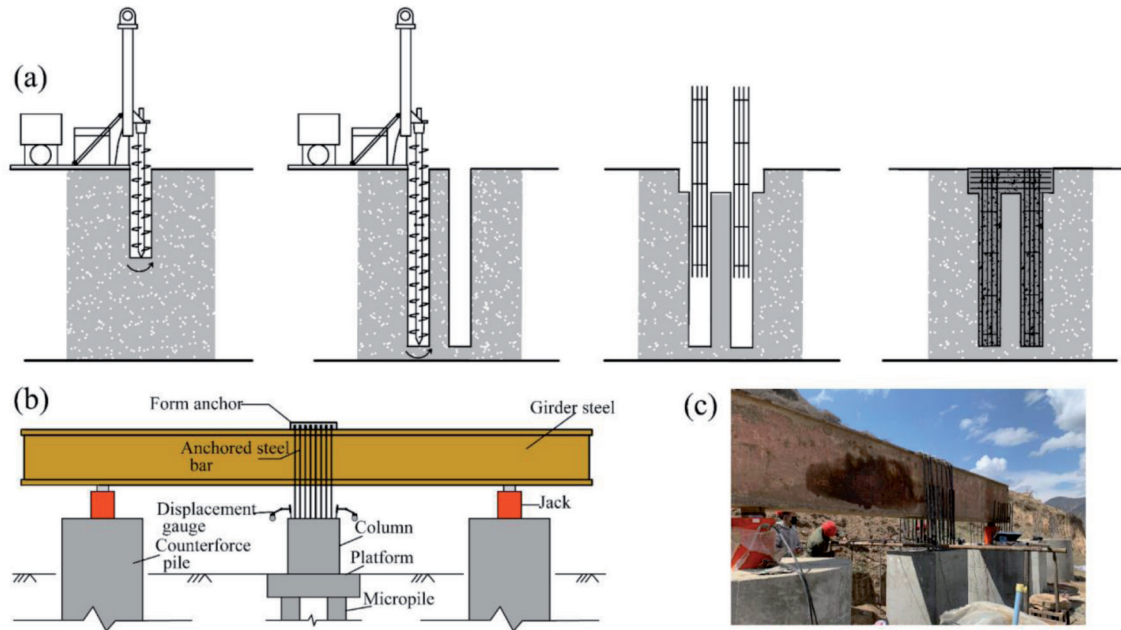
Construction steps and loading device schematic for micropile group installation: (a) Construction Steps; (b) Conceptual diagram of the testing load system; (c) Static load test site.
